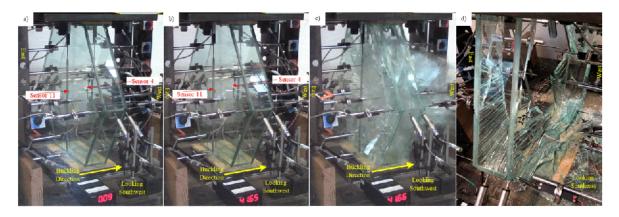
HGUb test to failure. (a) Test start, (b) 100% Load, (c) Failure, (d) Post failure
